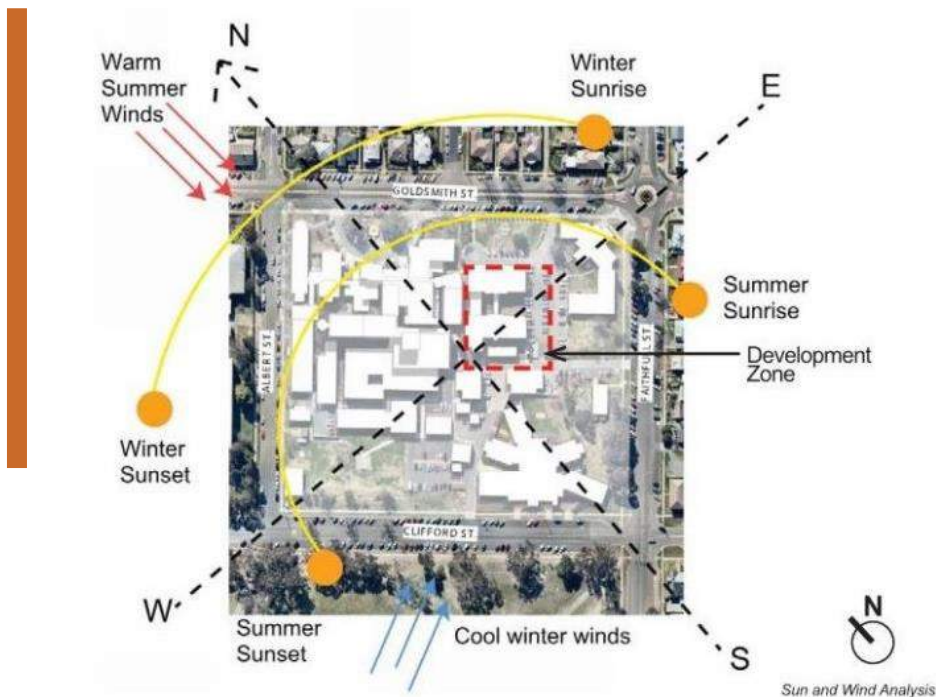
Extract of Site Analysis Plan (Drawing No. AA02-2301) (Source: BLP)
